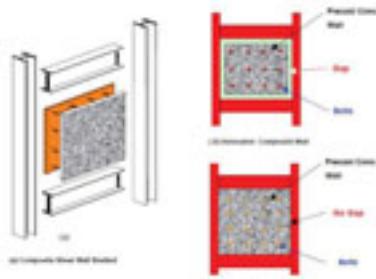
Typical load transfer mechanisms with composite shear walls.
